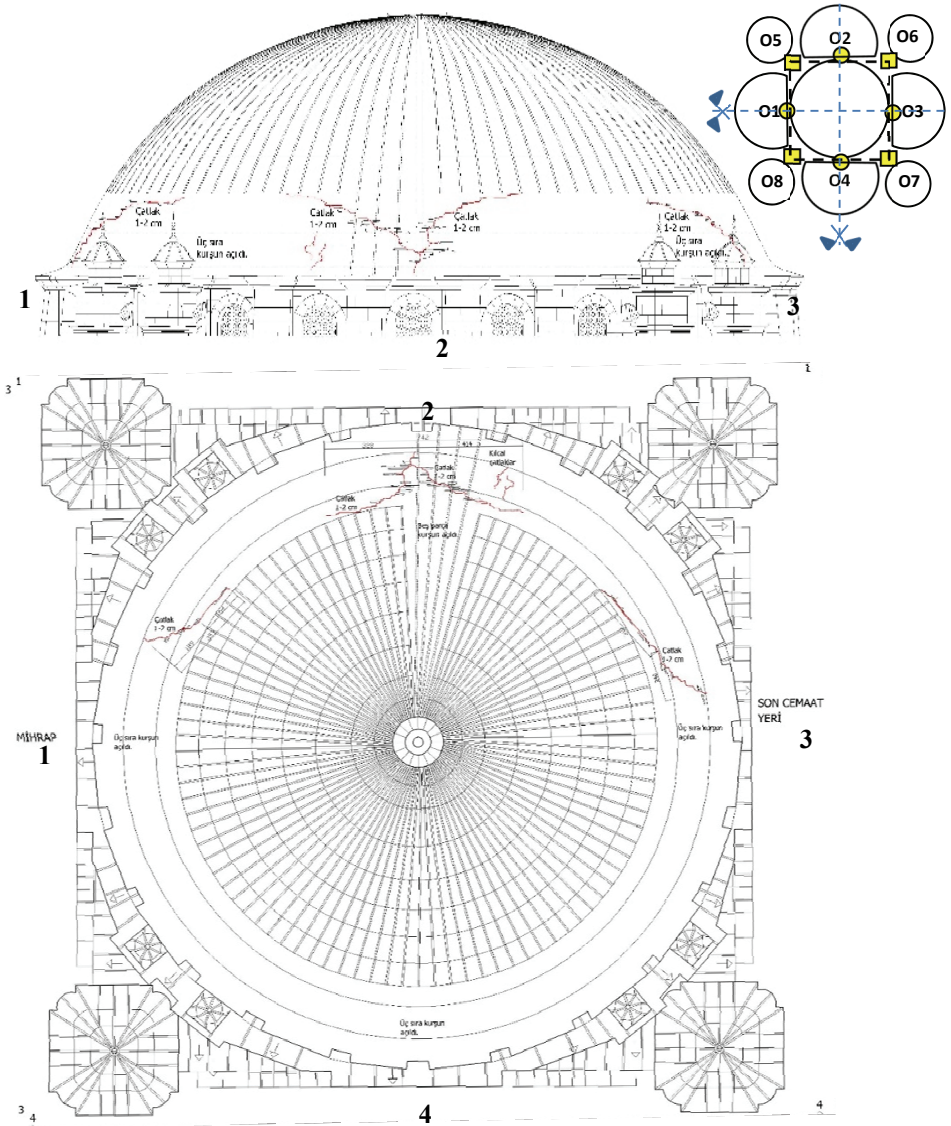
Damage patterns on the main dome in plan view (low). Damage around the stations 1, 2 and 3 from West view (top). The upper right corner (reoriented) sketch shows the instrument layout in plan view [33].
